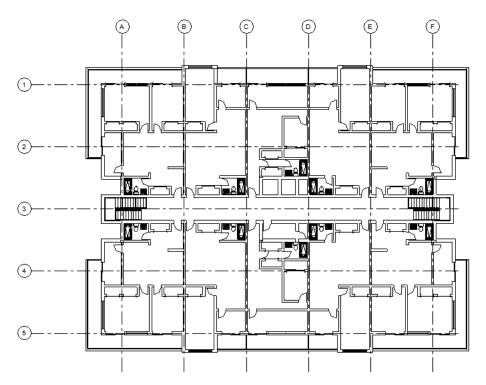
Plan of case study apartment building drawn using Revit Architecture
